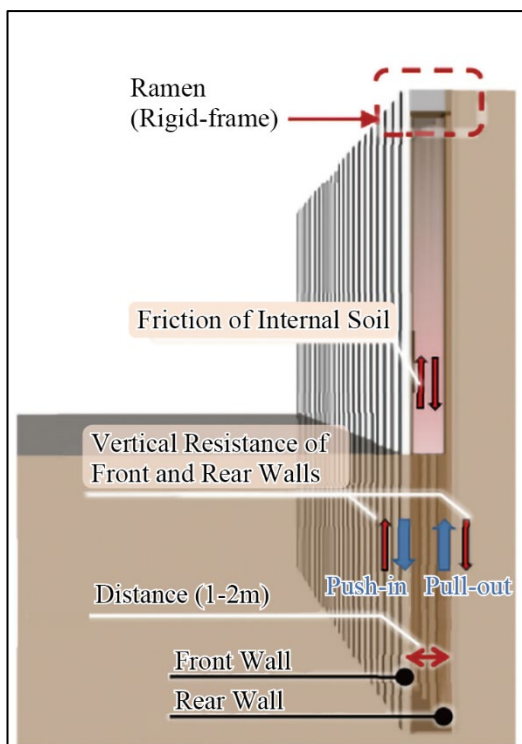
Overview of Retaining System by Double-layered Sheet Piles
